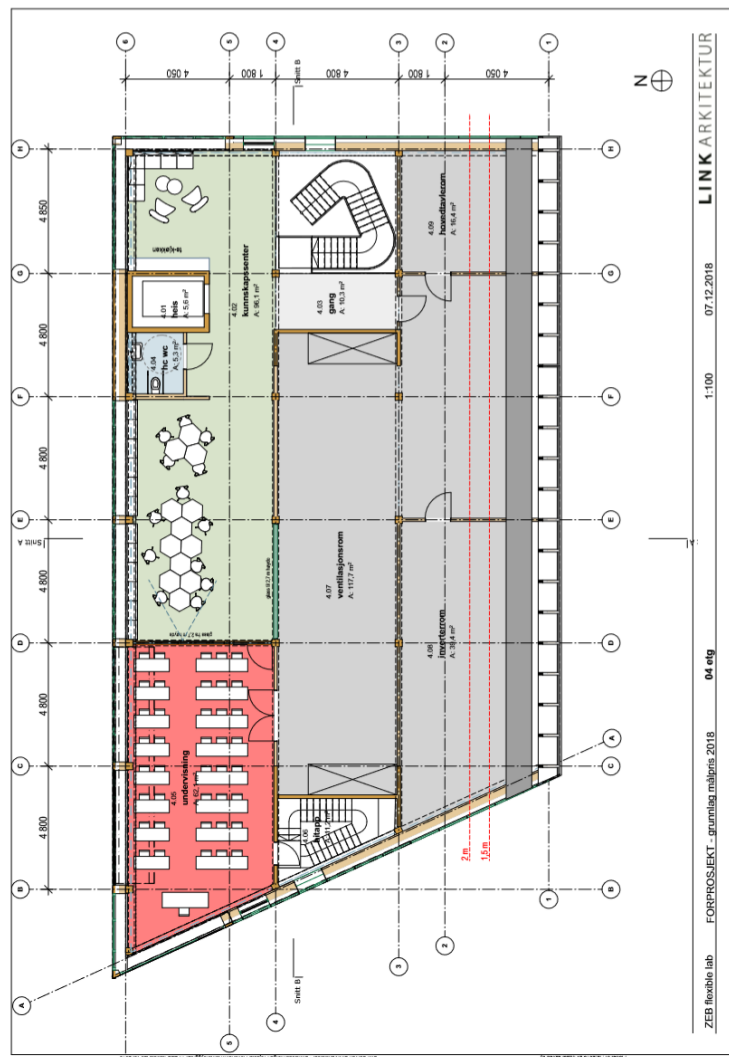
Floor plan of the fourth floor of ZEB Laboratory.
